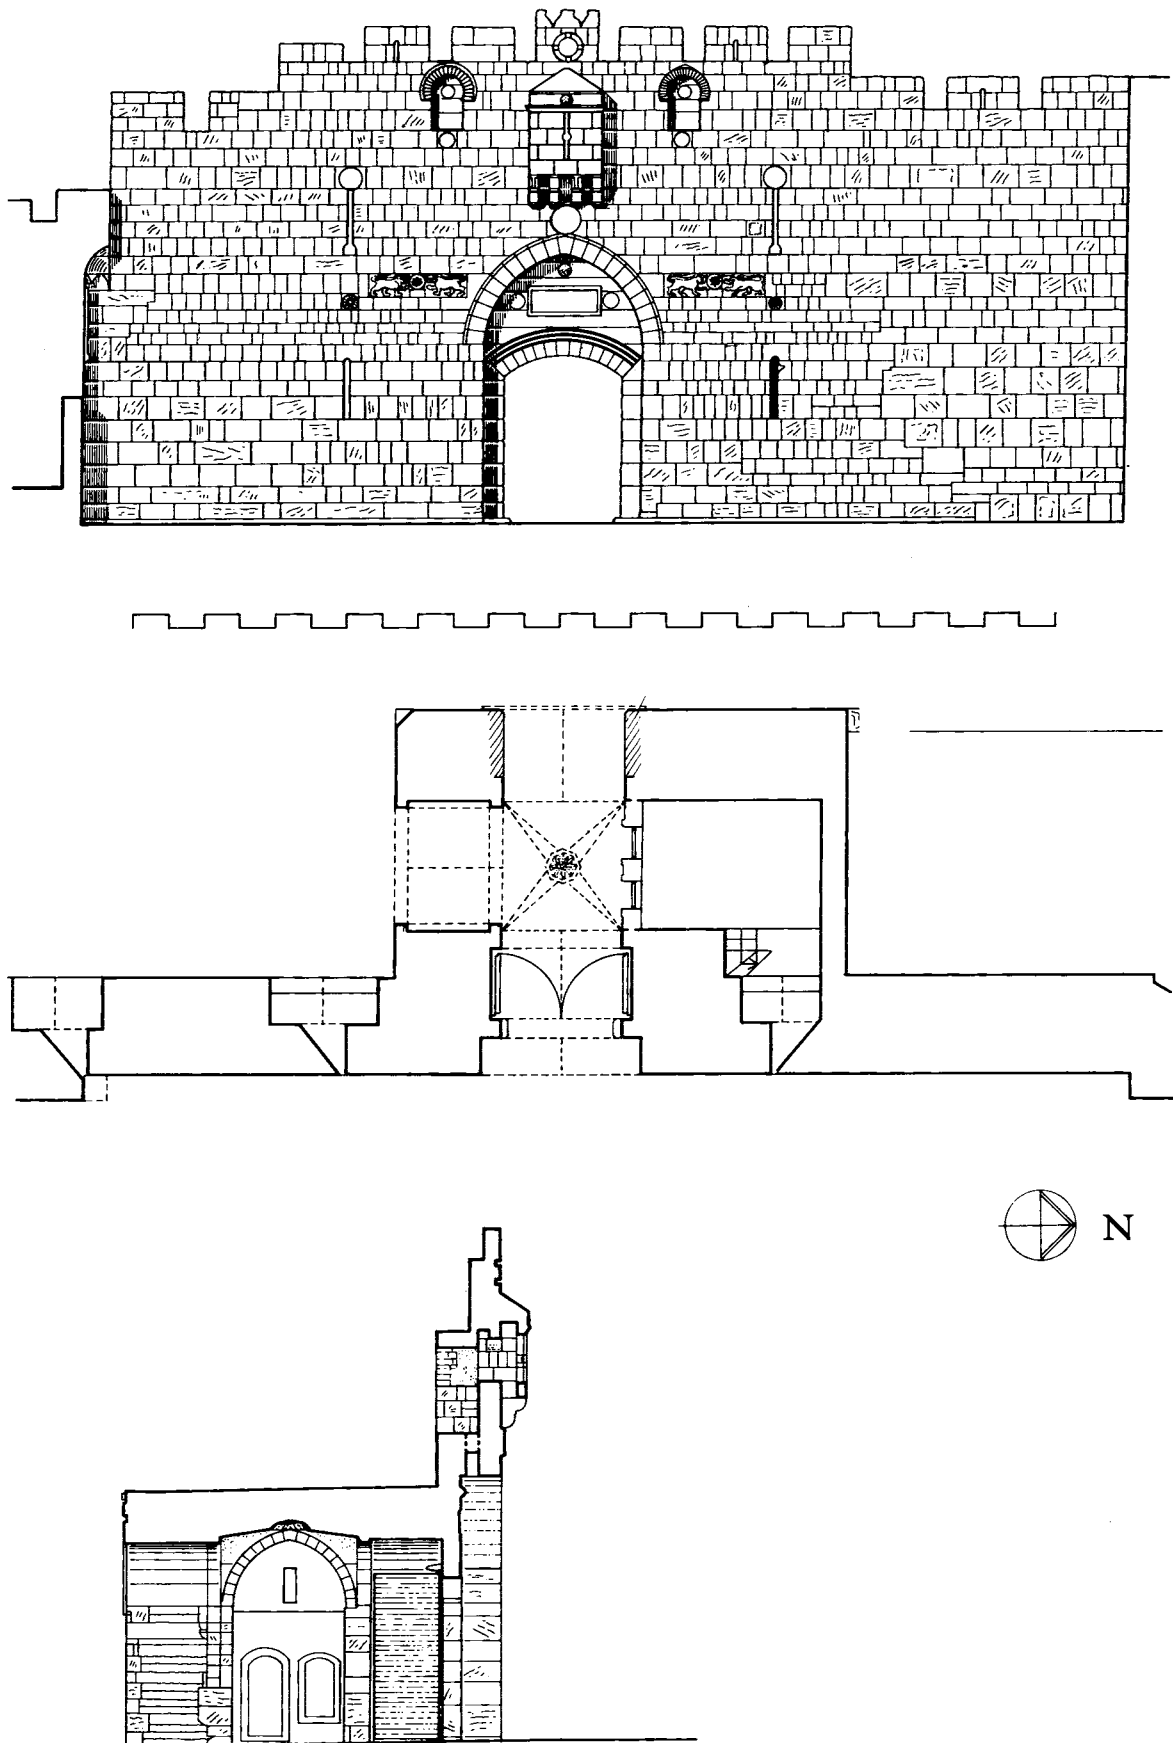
St Stephen's Gate (Lion Gate, Bab Sitti Maryam) (C)—East elevation; ground plan; and EW Section.
